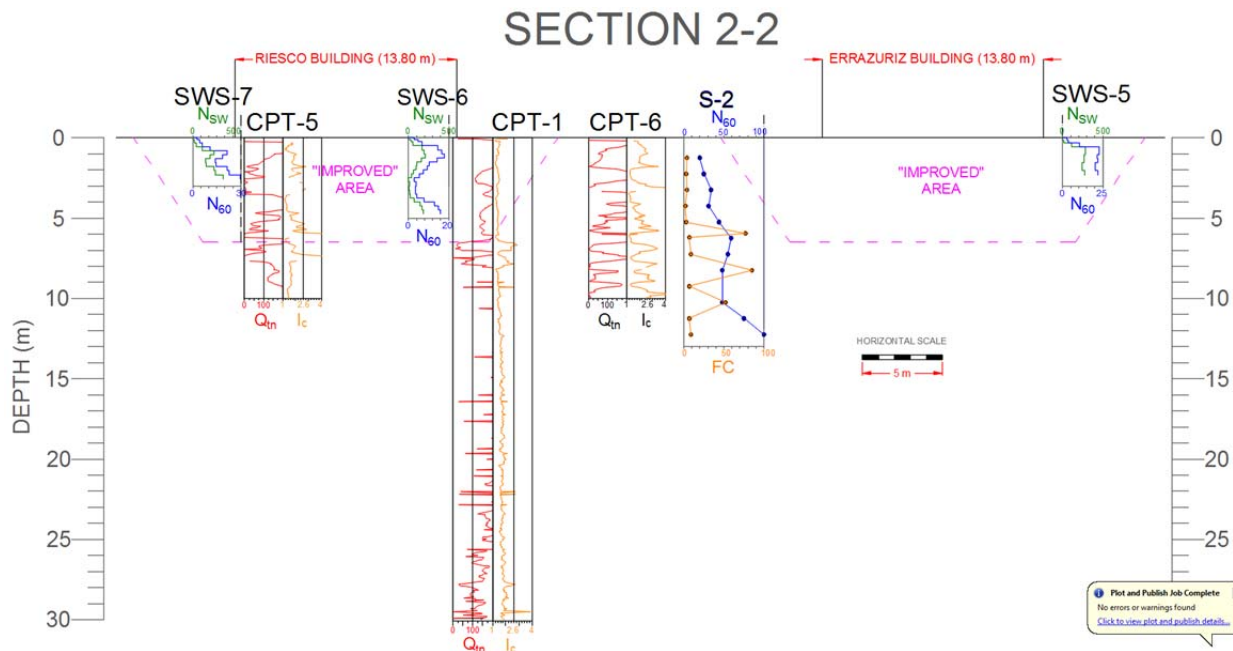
Section 2-2 through the north side of Buildings Riesco and Errazuriz
